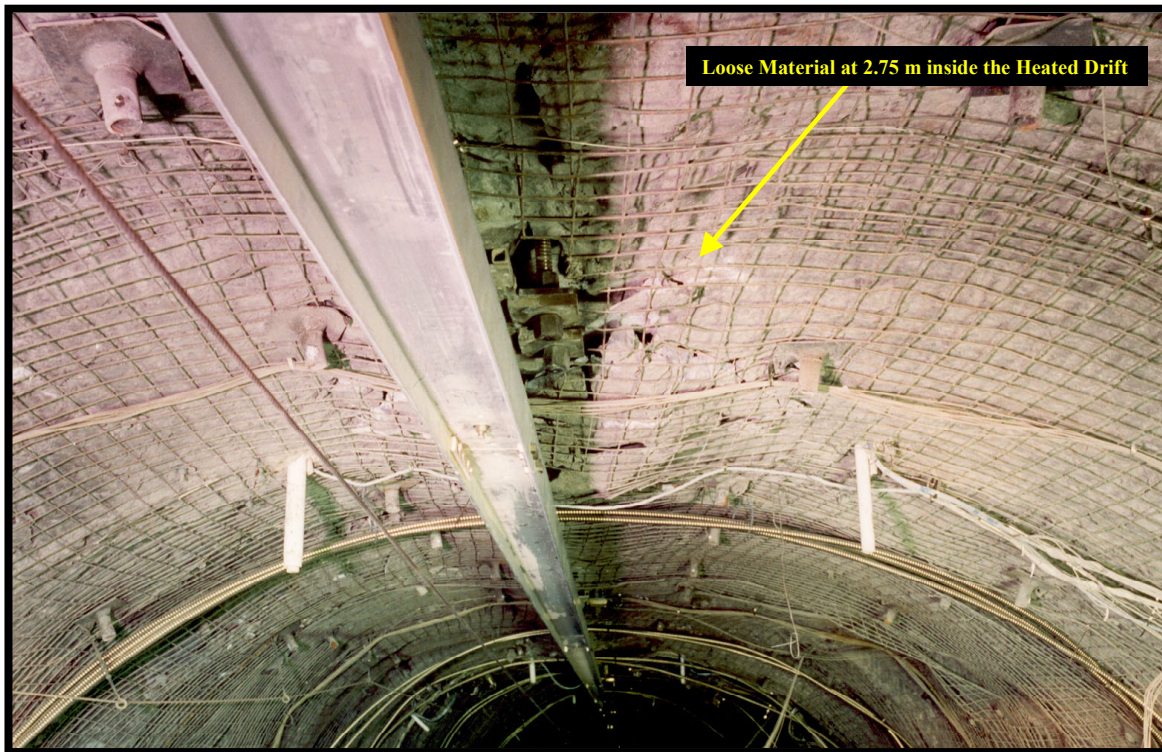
View of Roof Scaling Located 3 m From the DST Bulkhead and Retained in the Ground Support System Comprised of Rock Bolts and Welded Wire Fabric
